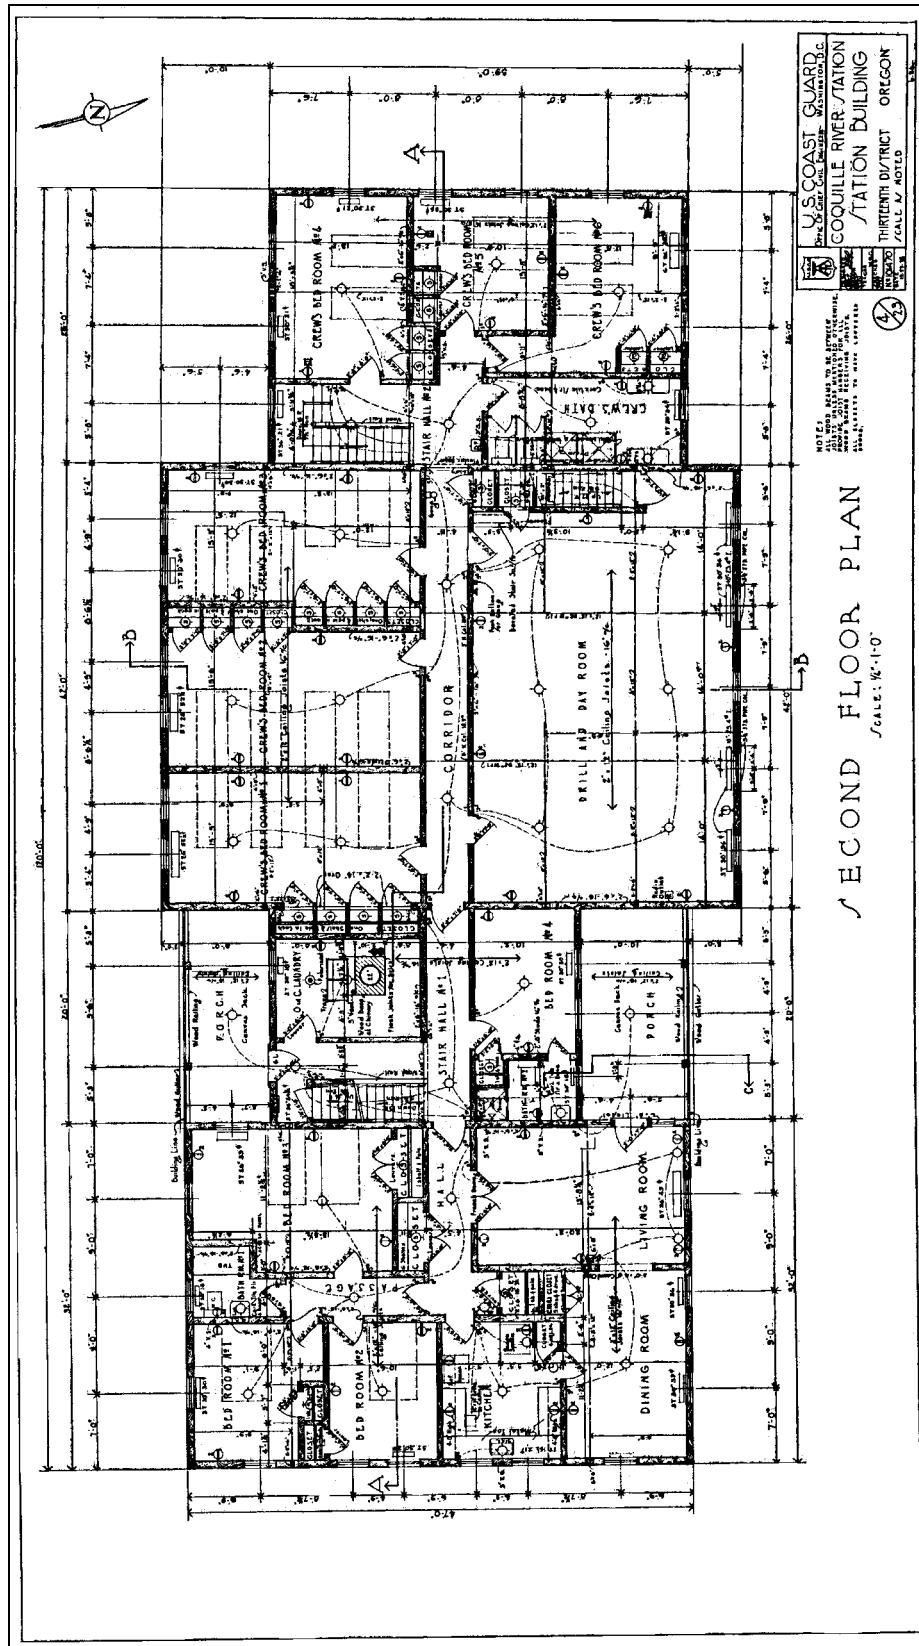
Coquille River Lifeboat Station, Second Floor Plan, 1938. Source: U.S. Coast Guard Civil Engineering Unit, Oakland, CA.
